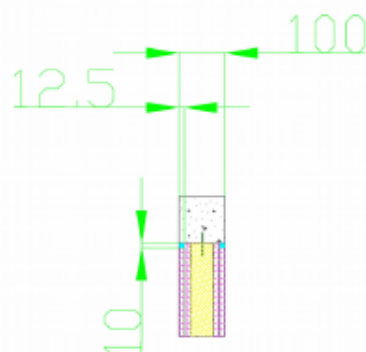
wall gypsum to stone thickness  $\geq 100$  mm
